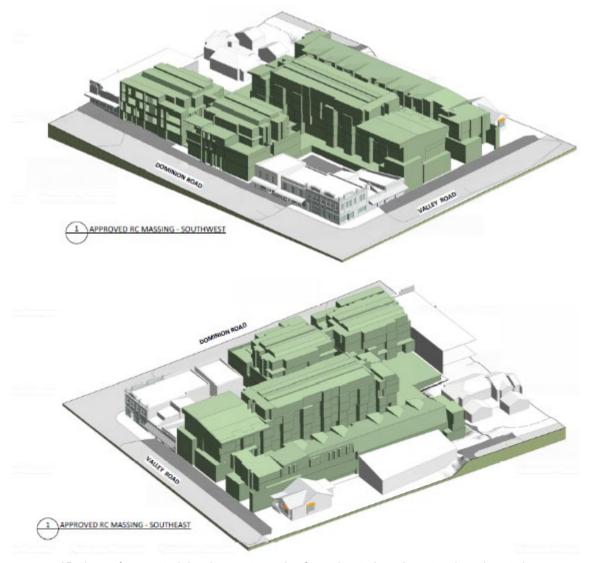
3D views of consented development massing from elevated southwest and southeast views (modelled by Ashton Mitchell from consented drawing set).
